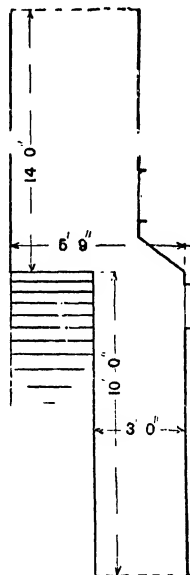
Linoleum-planner's Plan of Hall and Passage.
